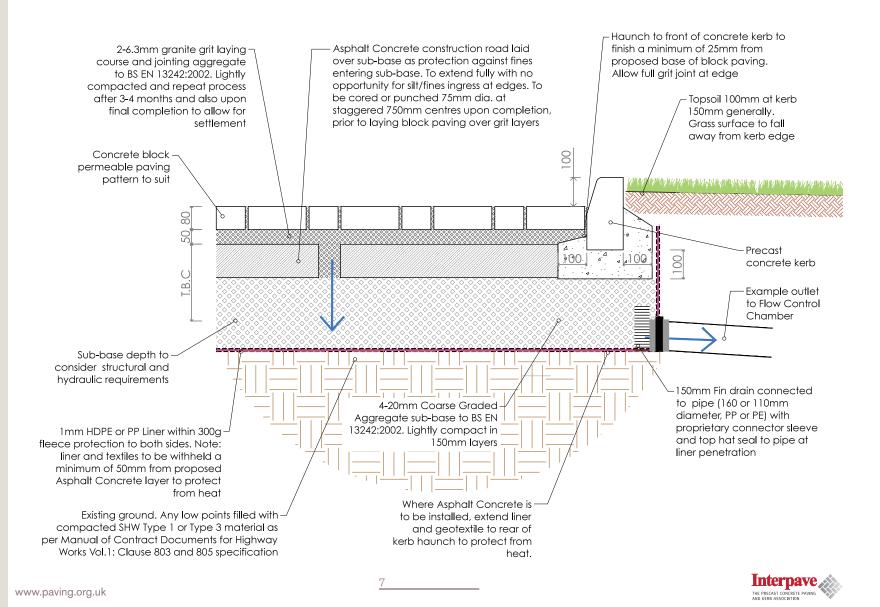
Lined Permeable Paving (System C) No Infiltration - with Sealed Outlet to Flow Control
